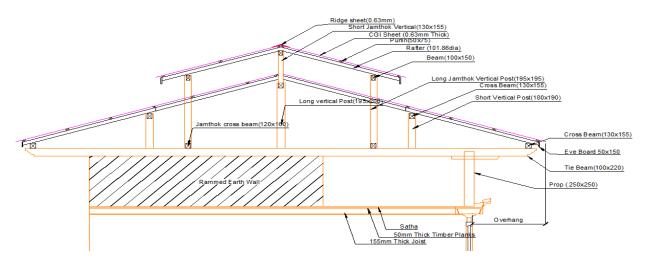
Jamthok roof configuration with CGI sheet roofing
